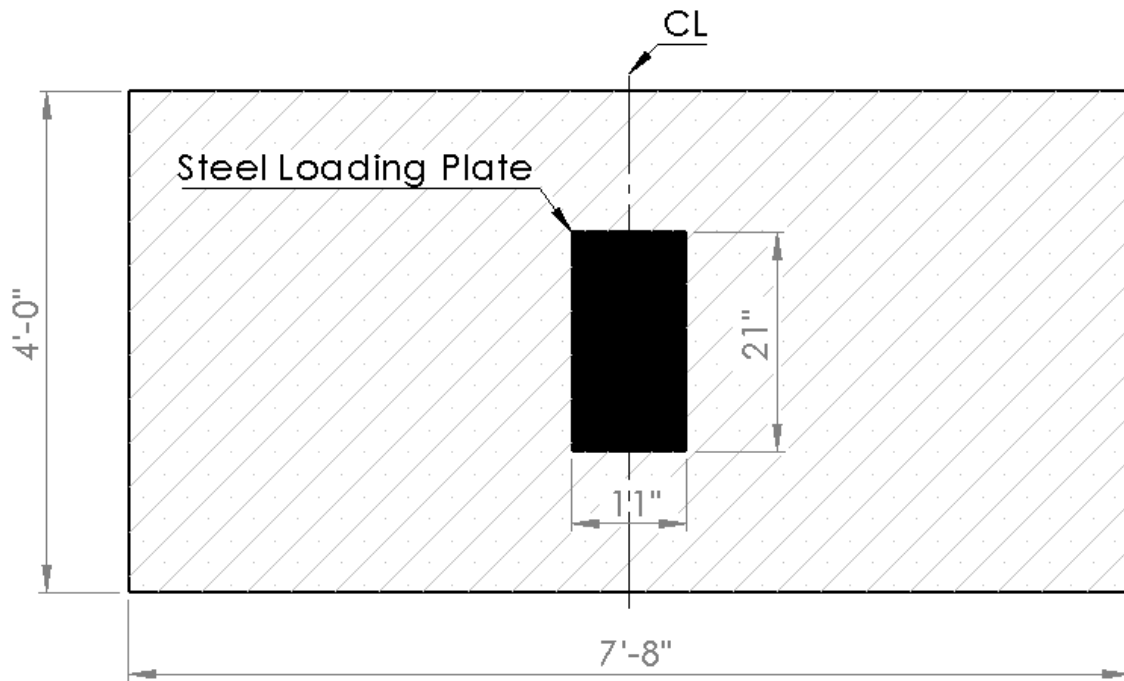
Schematic drawing of concrete panel with loading plate shown (plan view).
